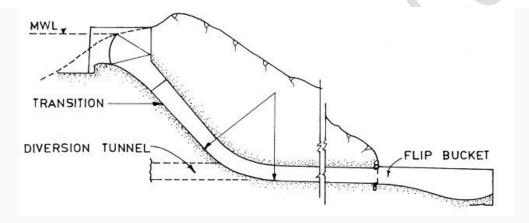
Typical Tunnel spillway. (Source: Khatsuria, R. M., 2005)
